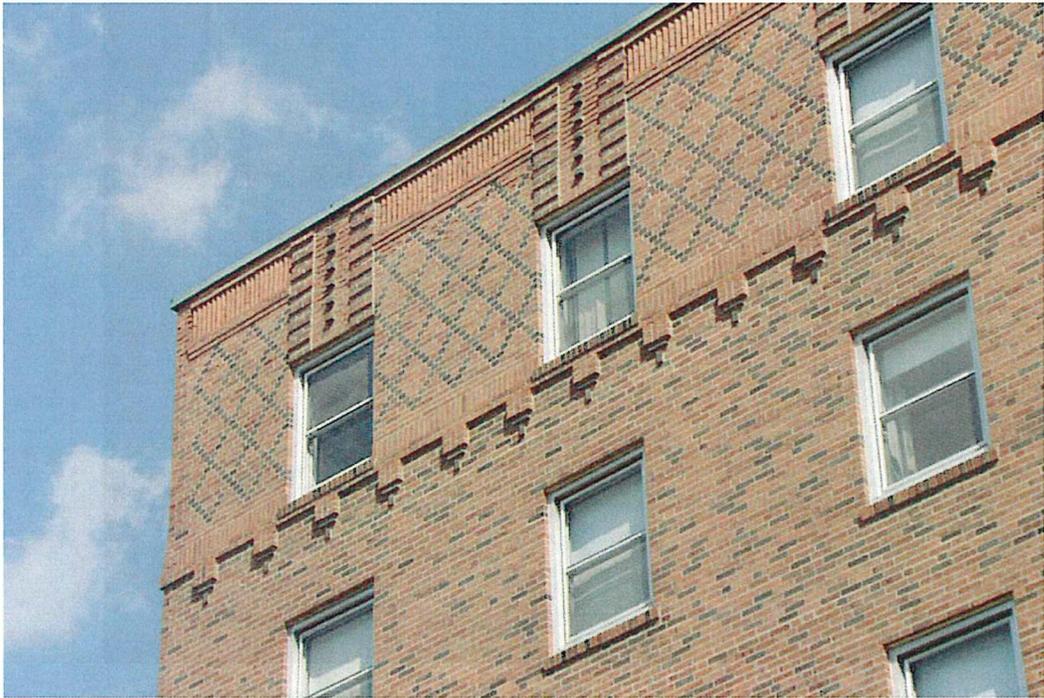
View of upper section of west facade. Note minor mortar deterioration.
